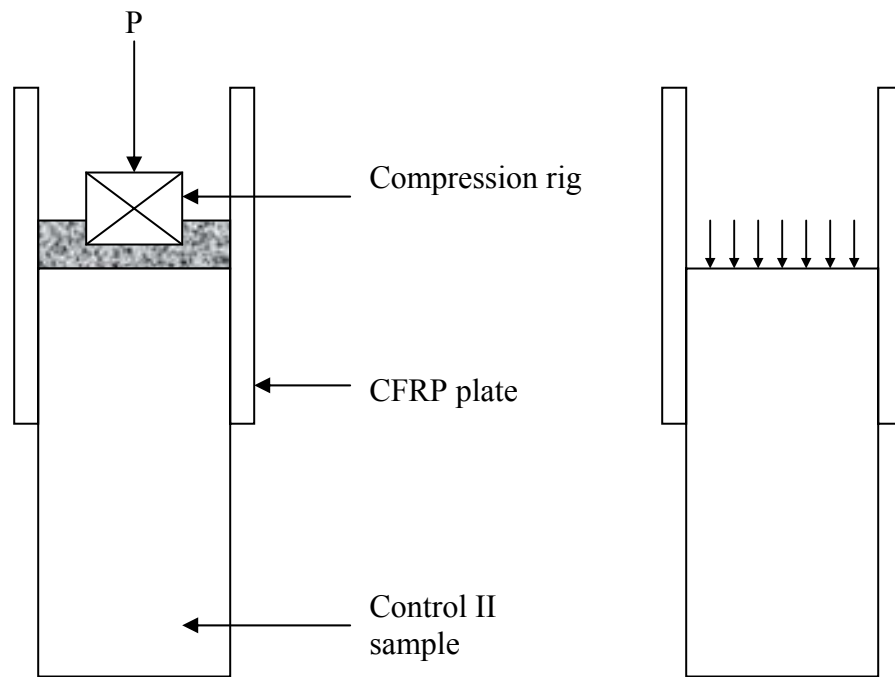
(b): Uniform compressive load acting on top of concrete prism surface for Control II and Hot/Wet/Dry samples
